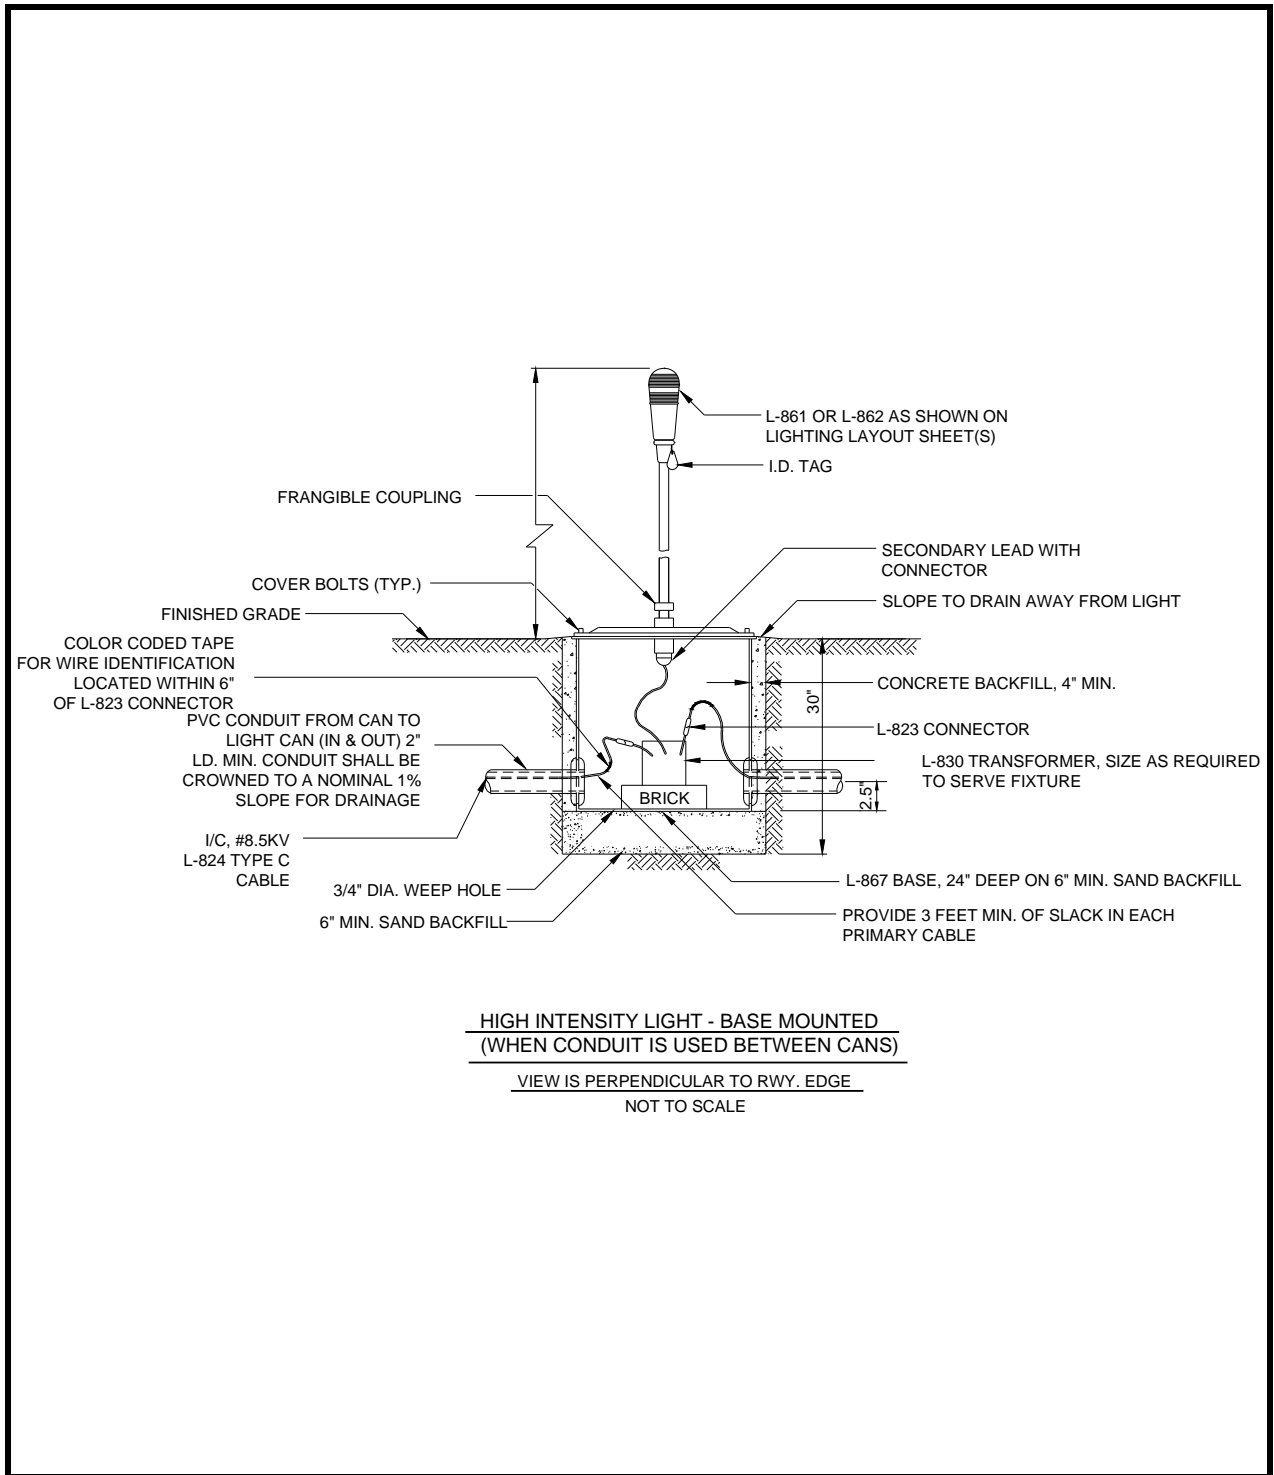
Typical Standard Details for Runway & Taxiway Edge Lights –High Intensity Light – Non-adjustable Base-mounted.
